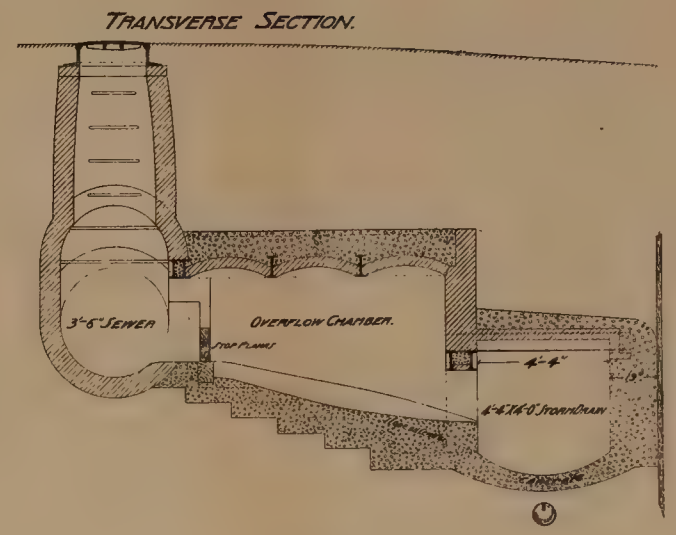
DETAIL OF OVERFLOW CONNECTION AT DAY ST.
